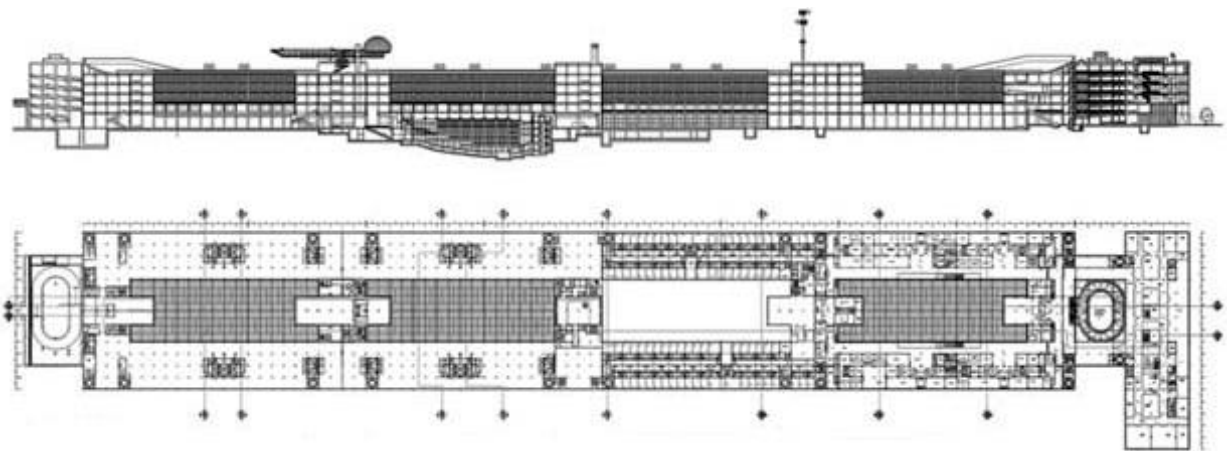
Plan and section through the adapted new design (Renzo Piano Building Workshop, 2003).
